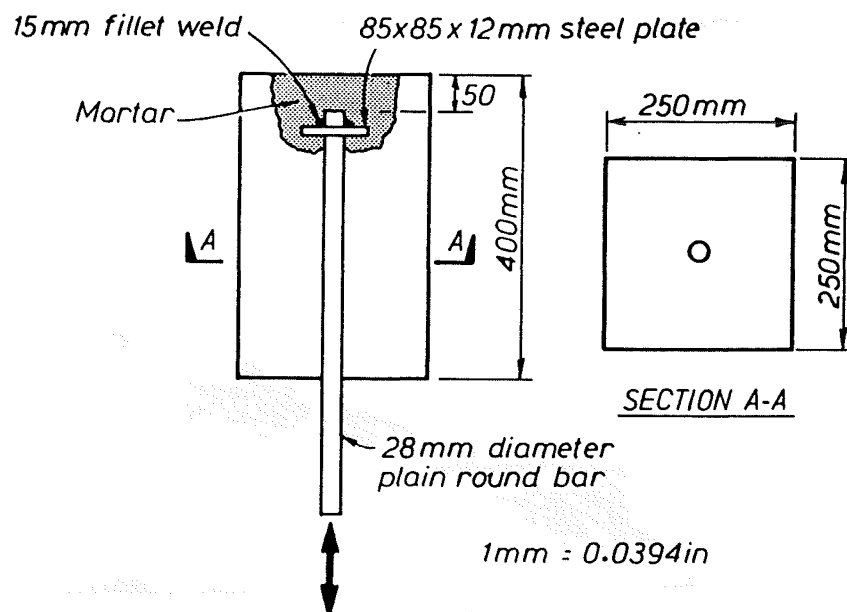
Test specimen for anchorage-retrofit detail using a steel end plate [Park et al 1993].
